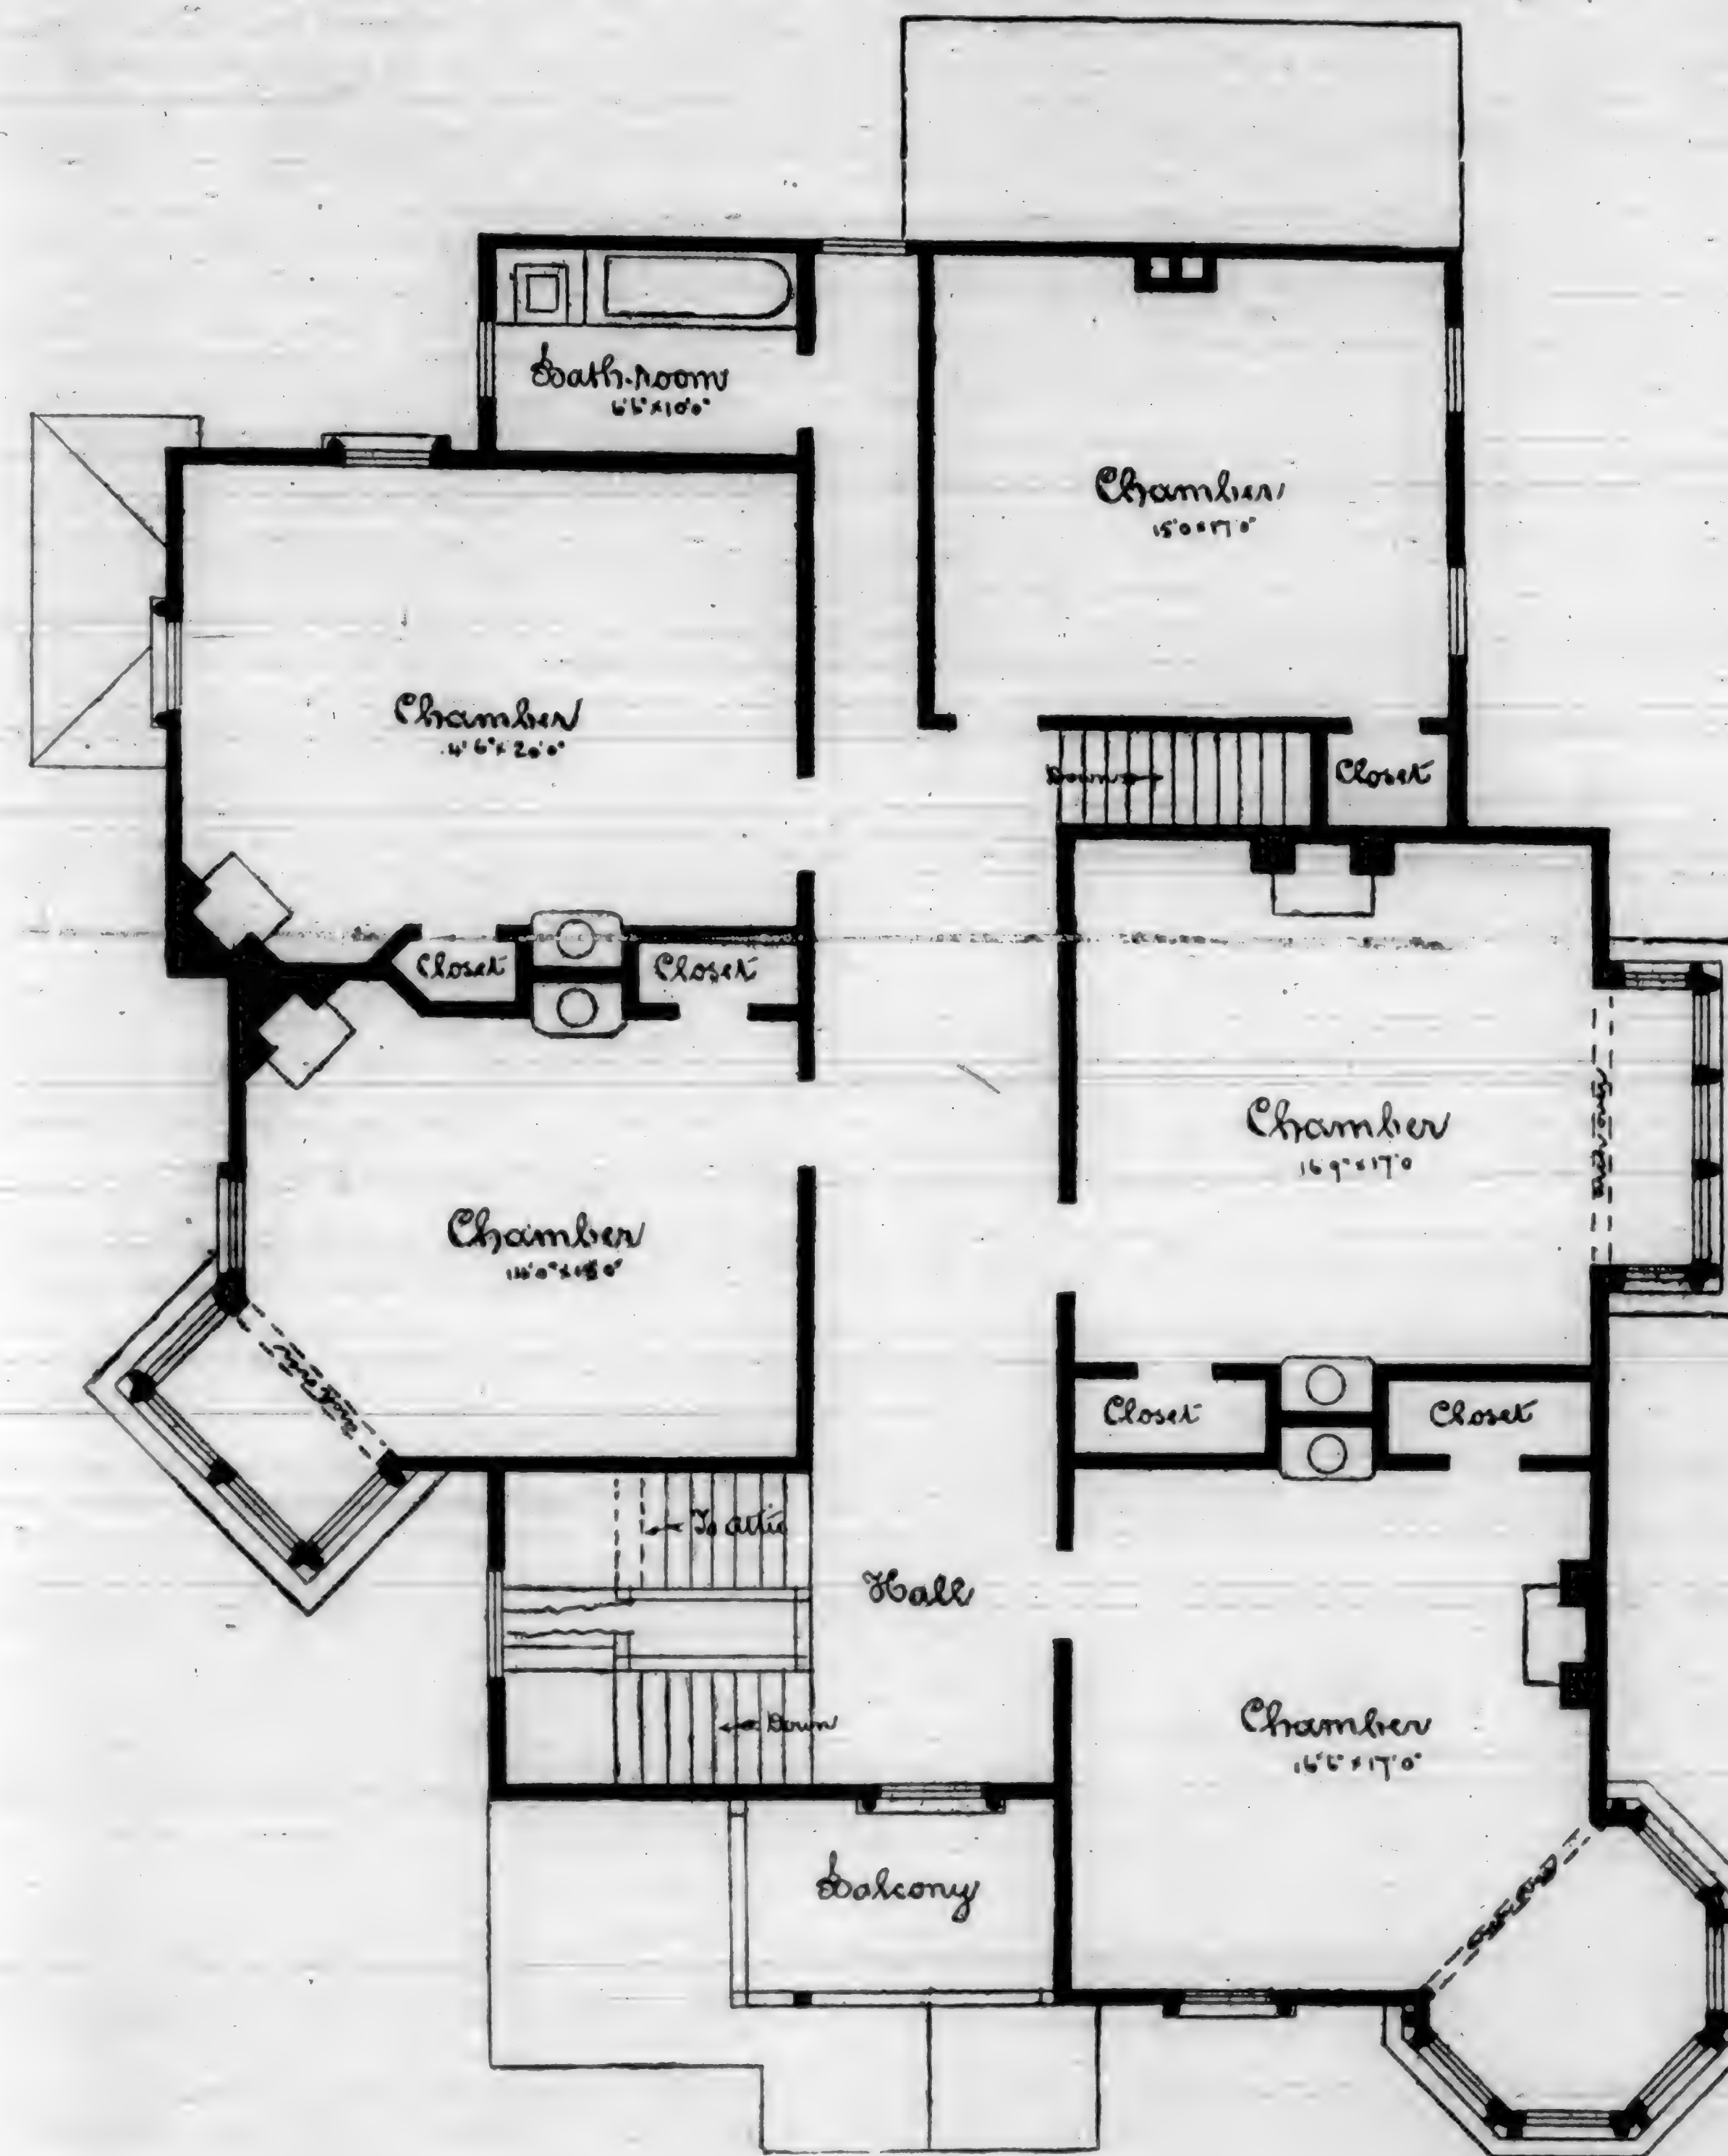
SECOND FLOOR PLAN OF SUBURBAN RESIDENCE.
